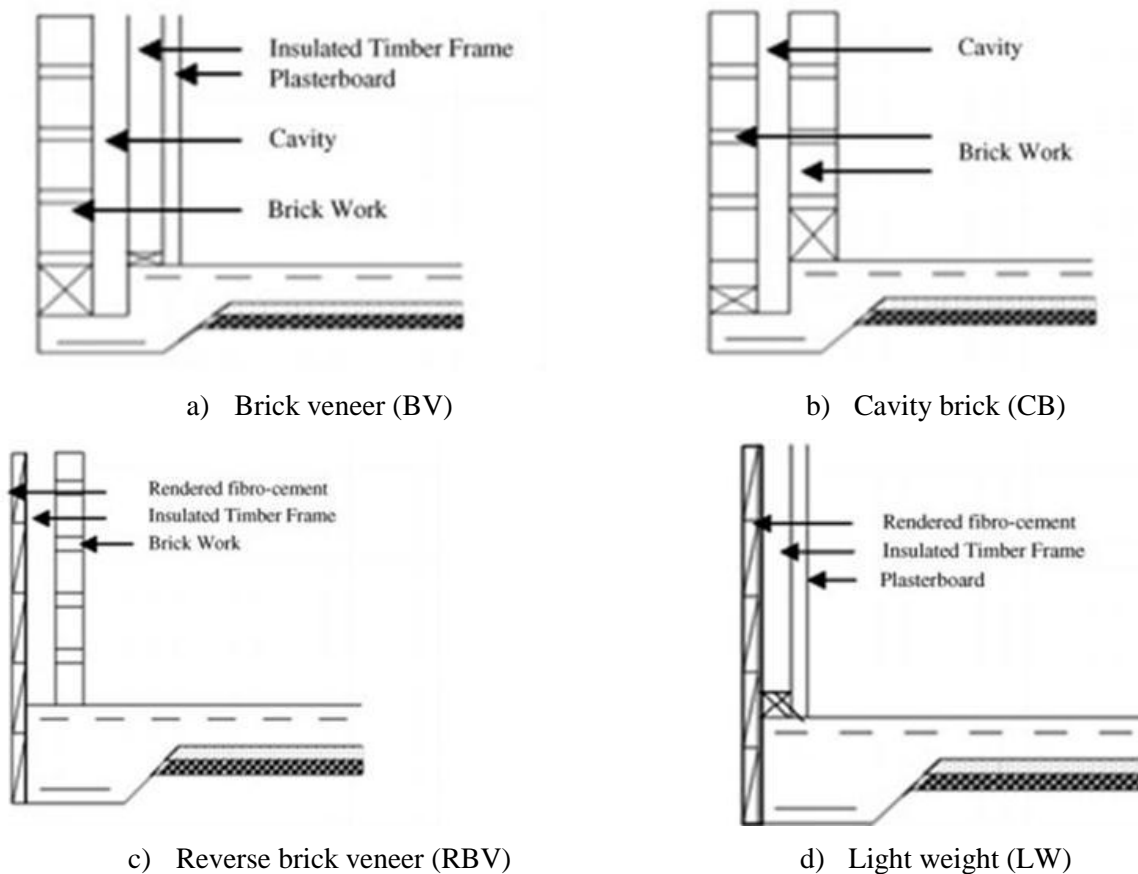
Schematic of cross section of construction type (Gregory et al., 2008)
